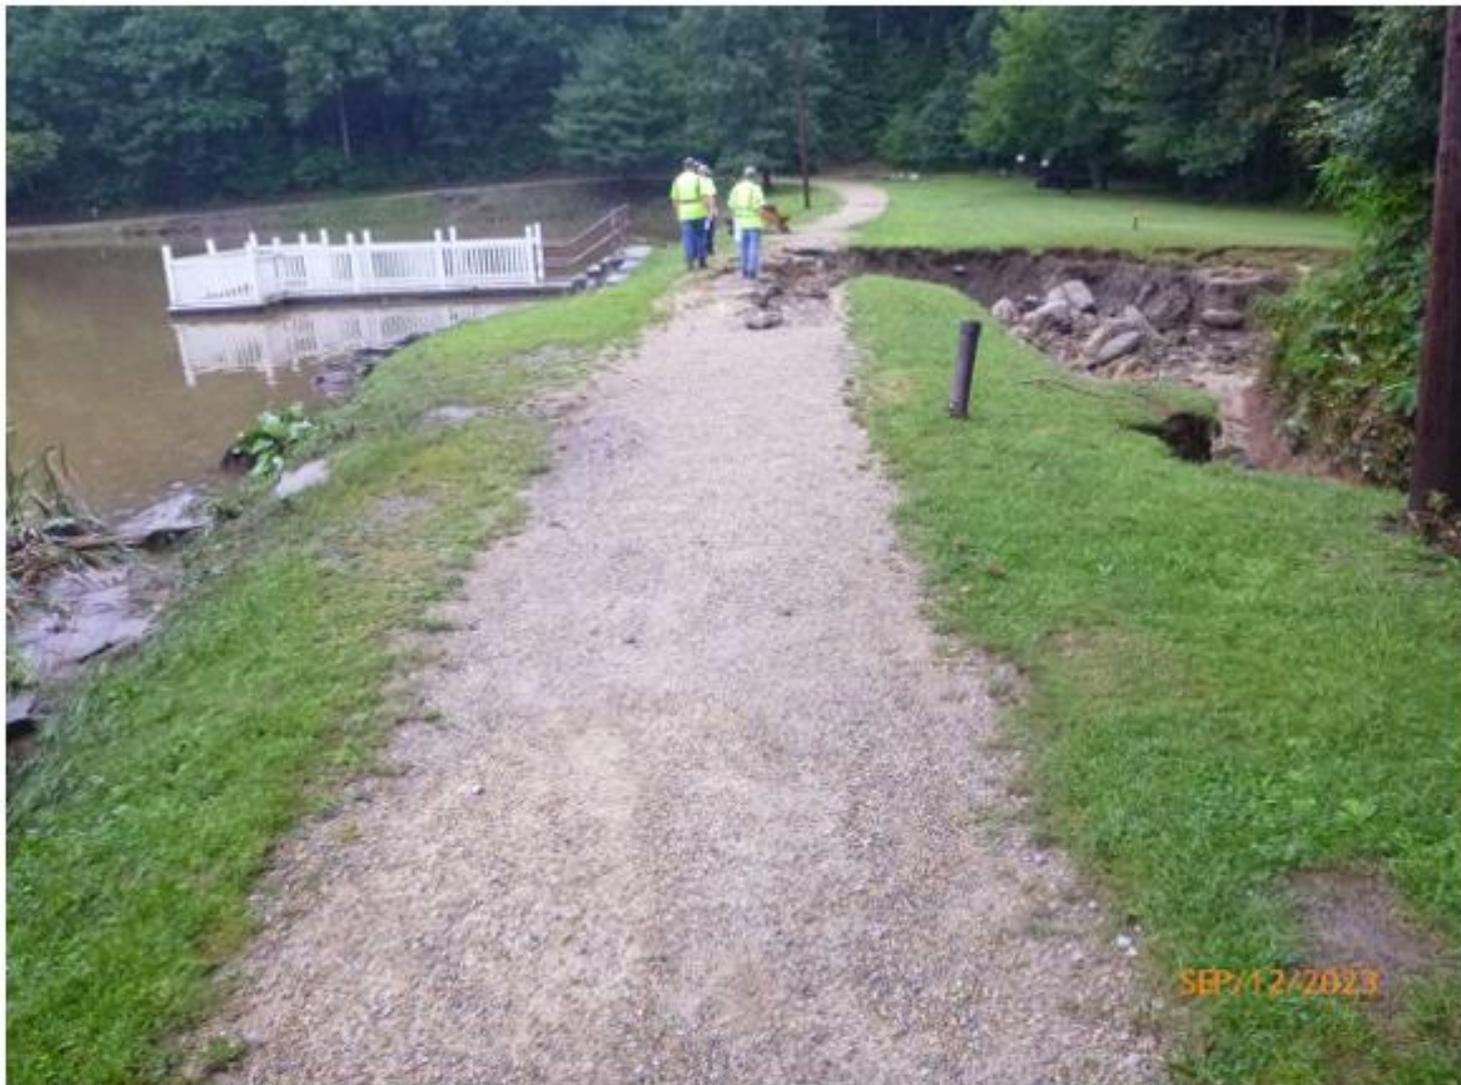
Overview of embankment crest looking left. Note downstream slope failure due to overtopping
